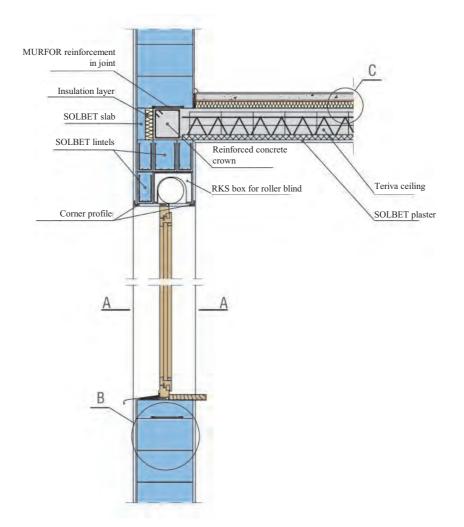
Example of an architectural detail. ACC system based construction is defect-free
